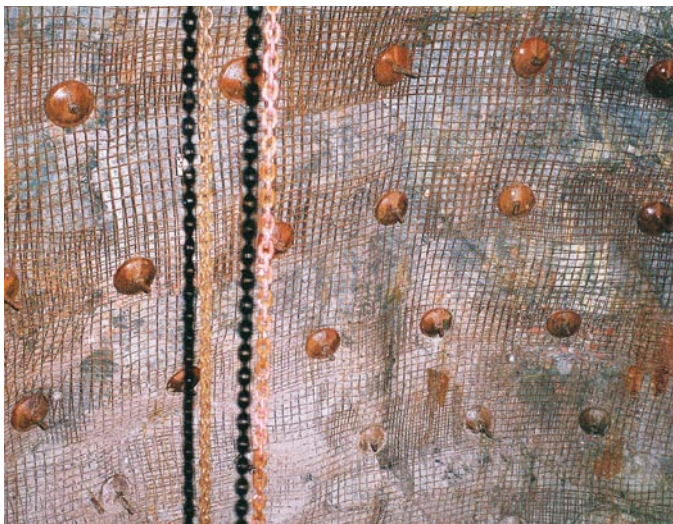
Fractured shaft wall with rockbolt supports and wire mesh
